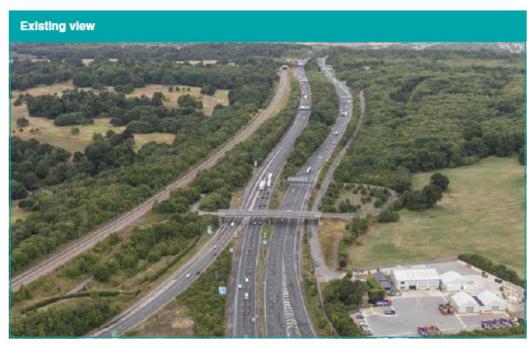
Existing M2/A2 along the A2 near Park Pale bridge, looking west
